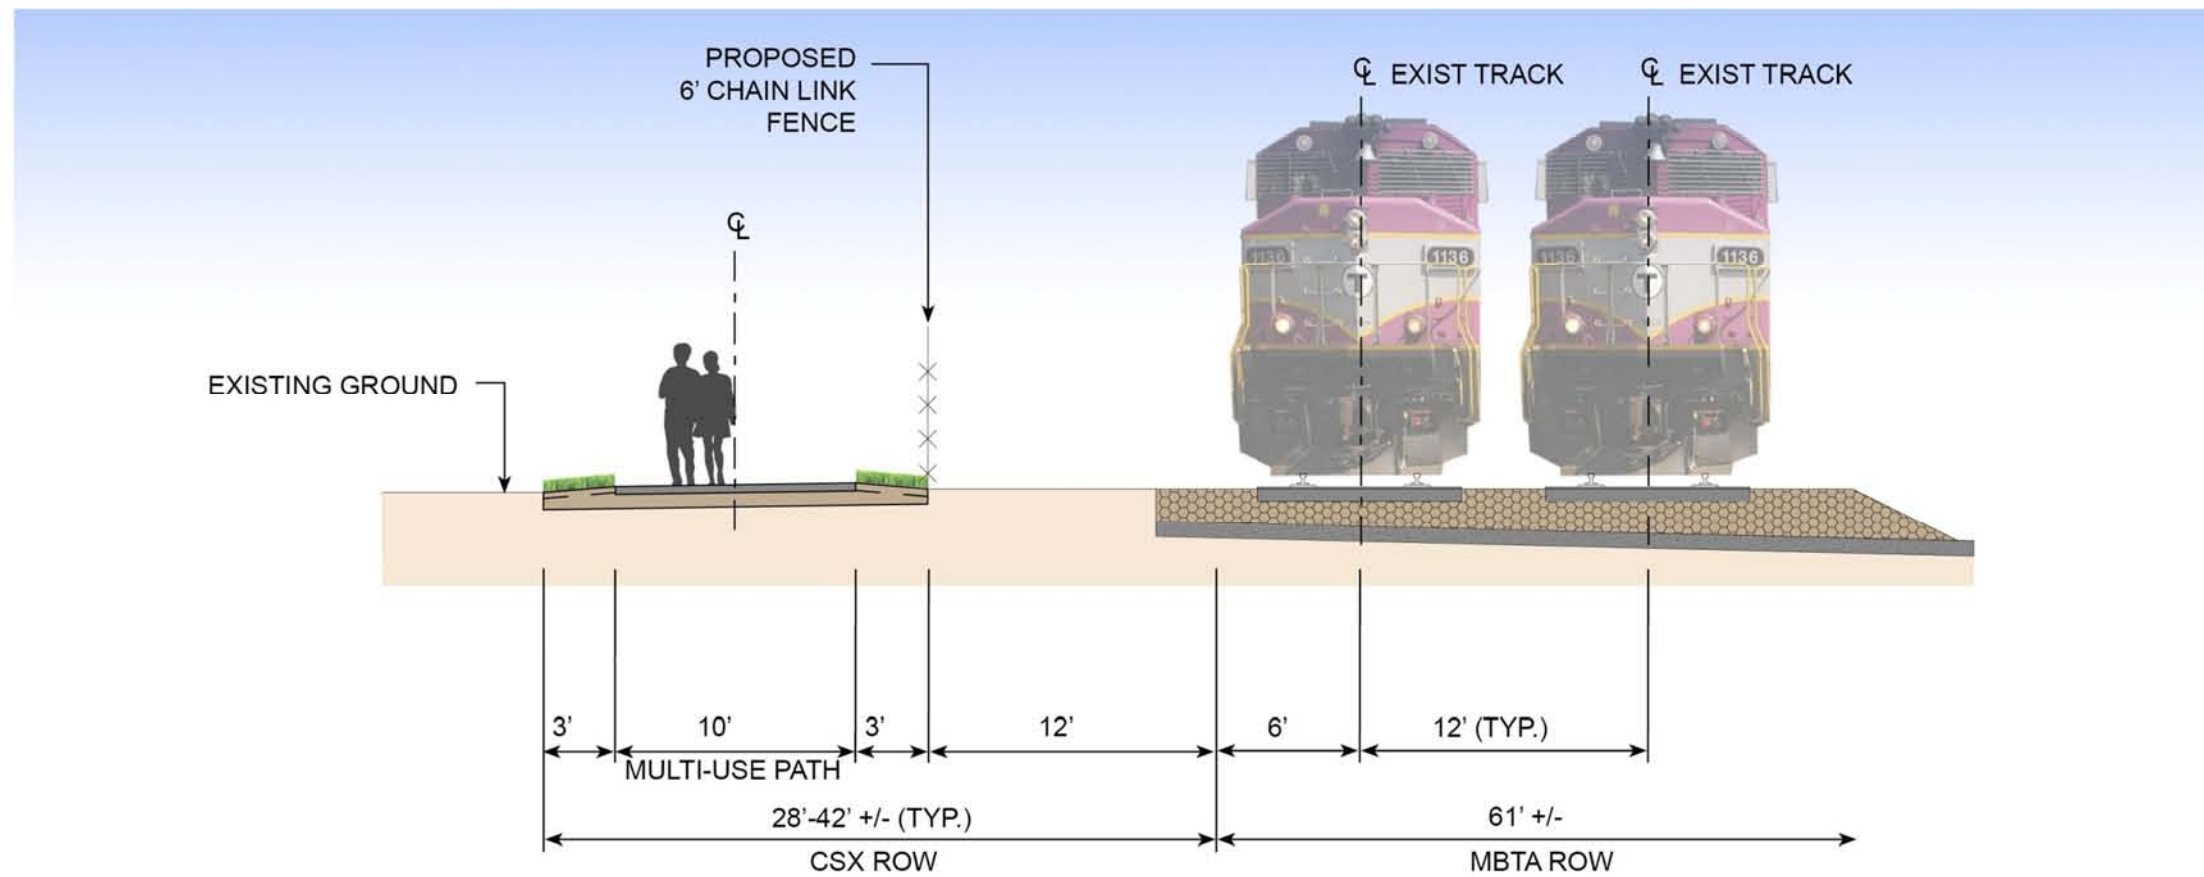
Multi-Use Path with Commuter Rail (“Rail with Trail”) – Typical Section (Broadway to Everett Border)
